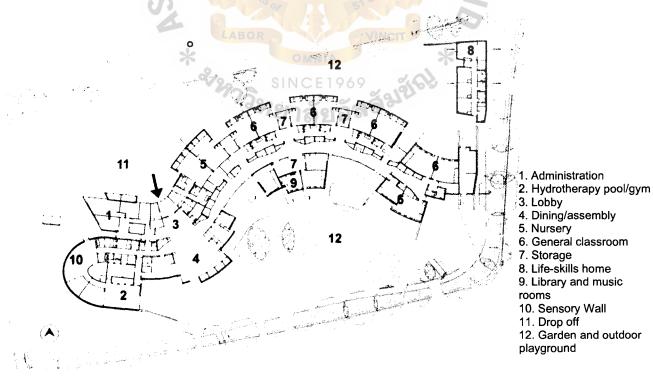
FLOOR PLAN: HAZELWOOD SCHOOL FOR THE MULTIPLE SENSORY IMPAIRED
